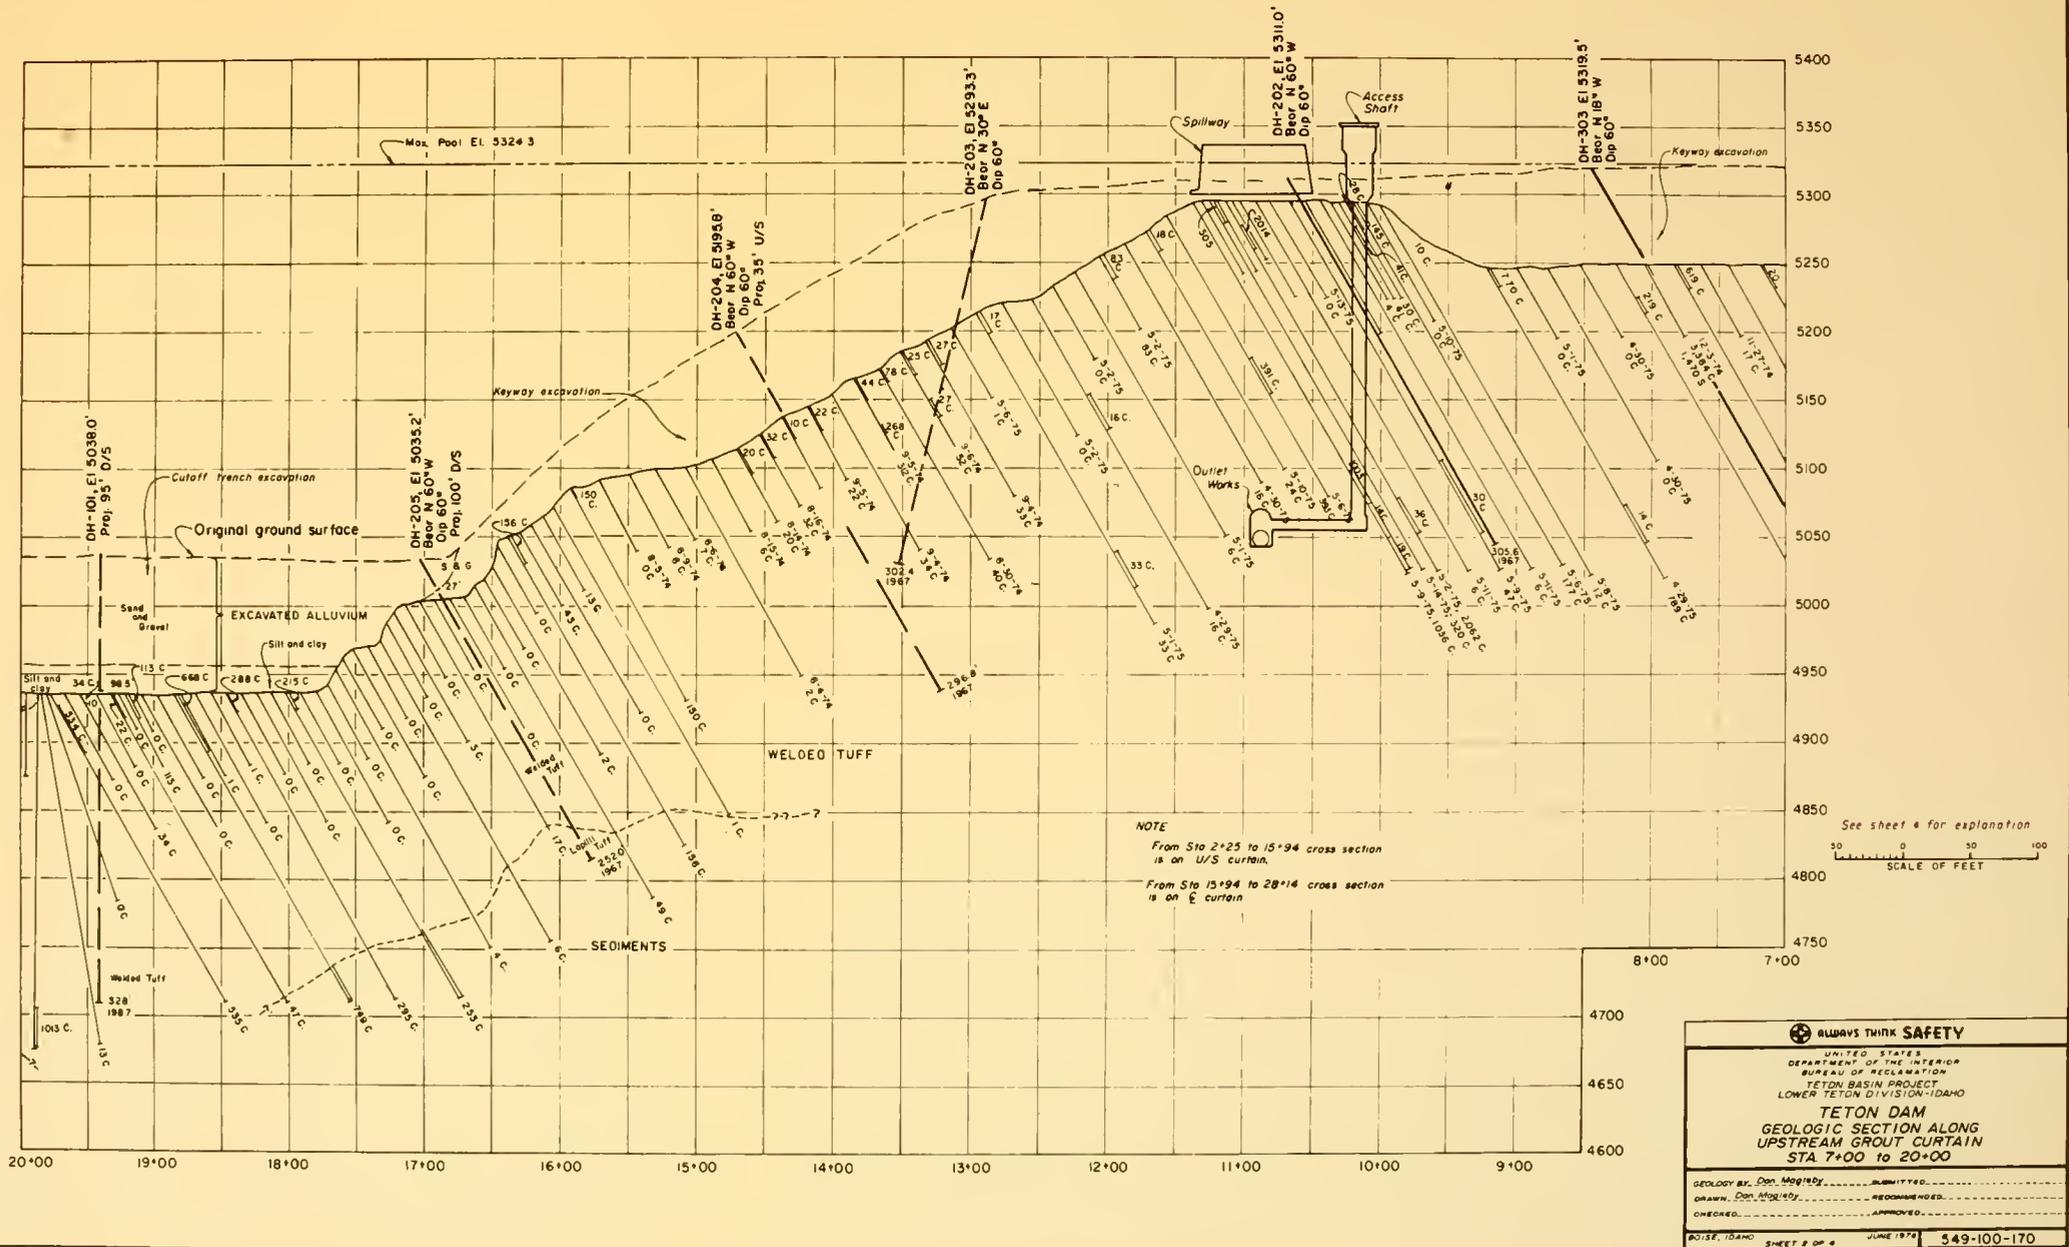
Geologic section along upstream row of holes of grout curtain, station -5+00 to station 49+00. (Sheet 2 of 4)
